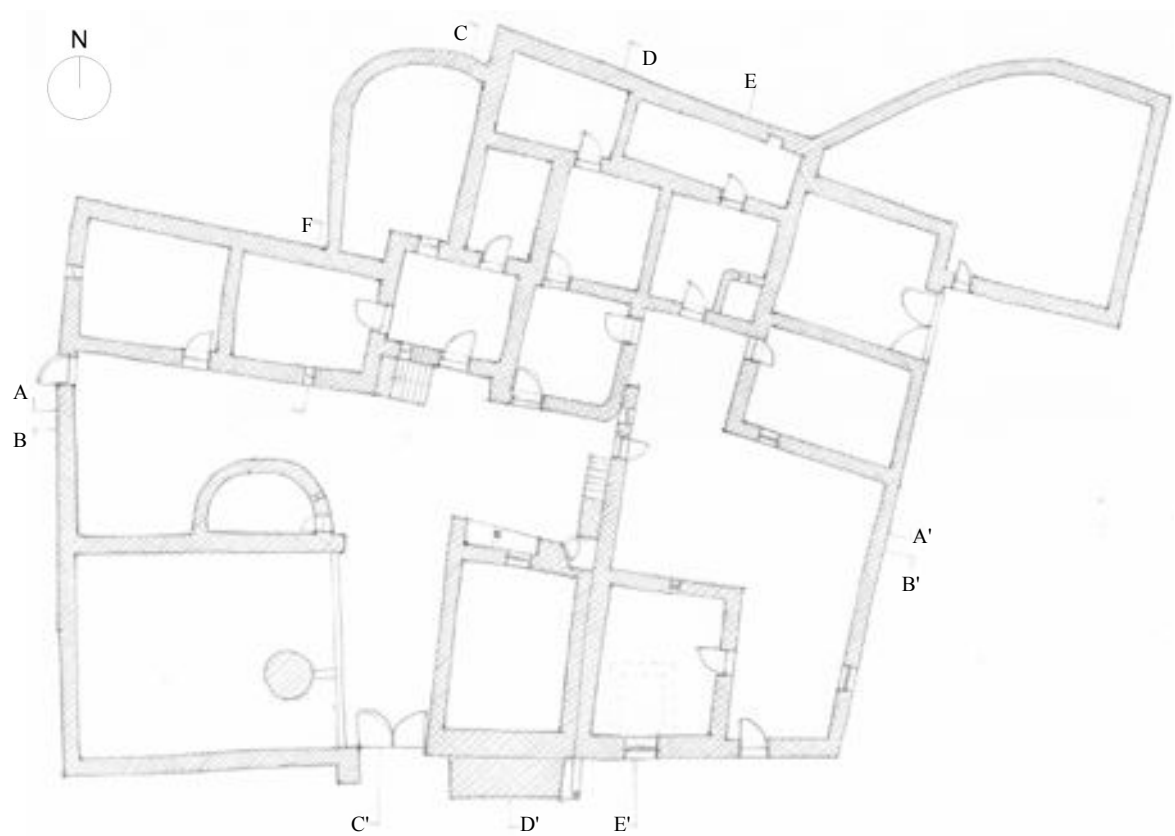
Floor Plan of a Core in the Village of Caçarelhos.
